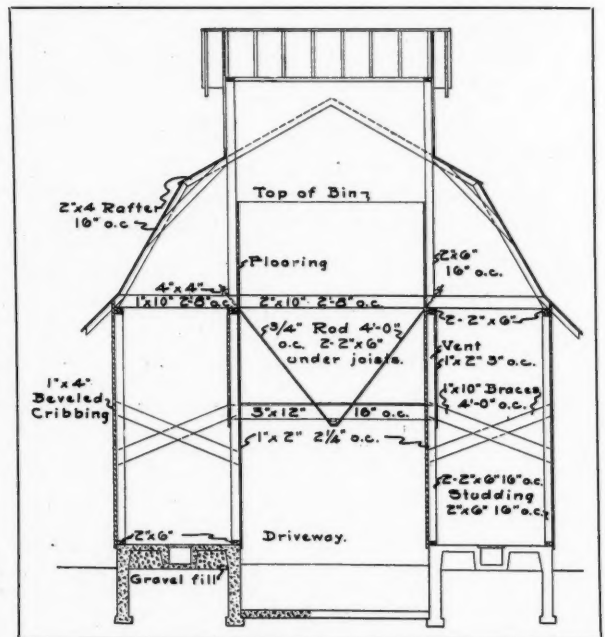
Section of a modern frame farm elevator with double crib and grain bins over driveway
